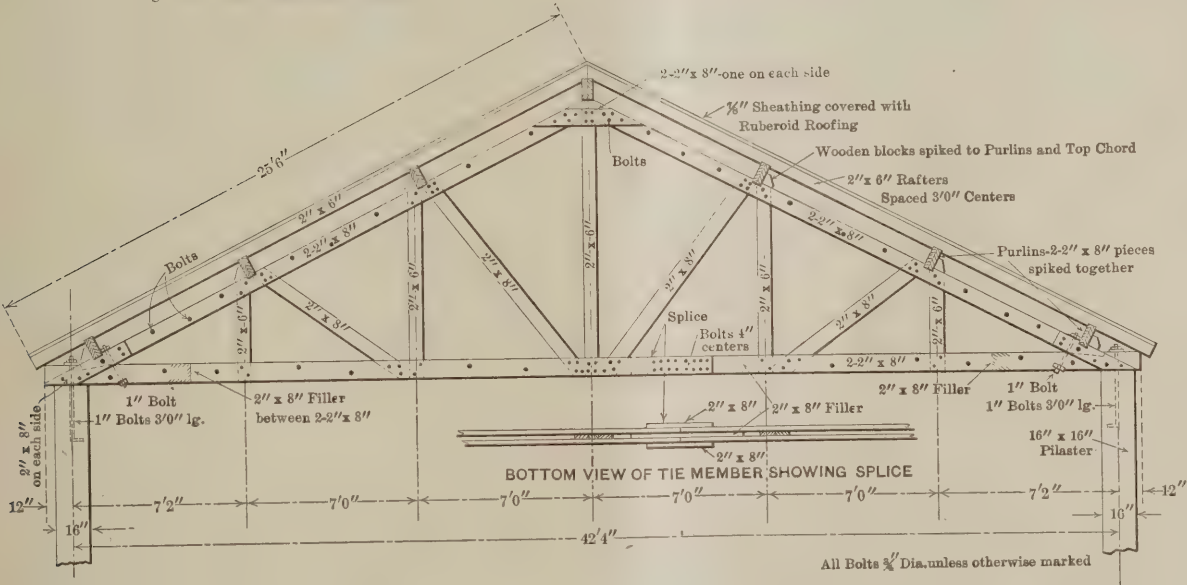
Elevation of one of the Trusses, Showing the General Construction.
